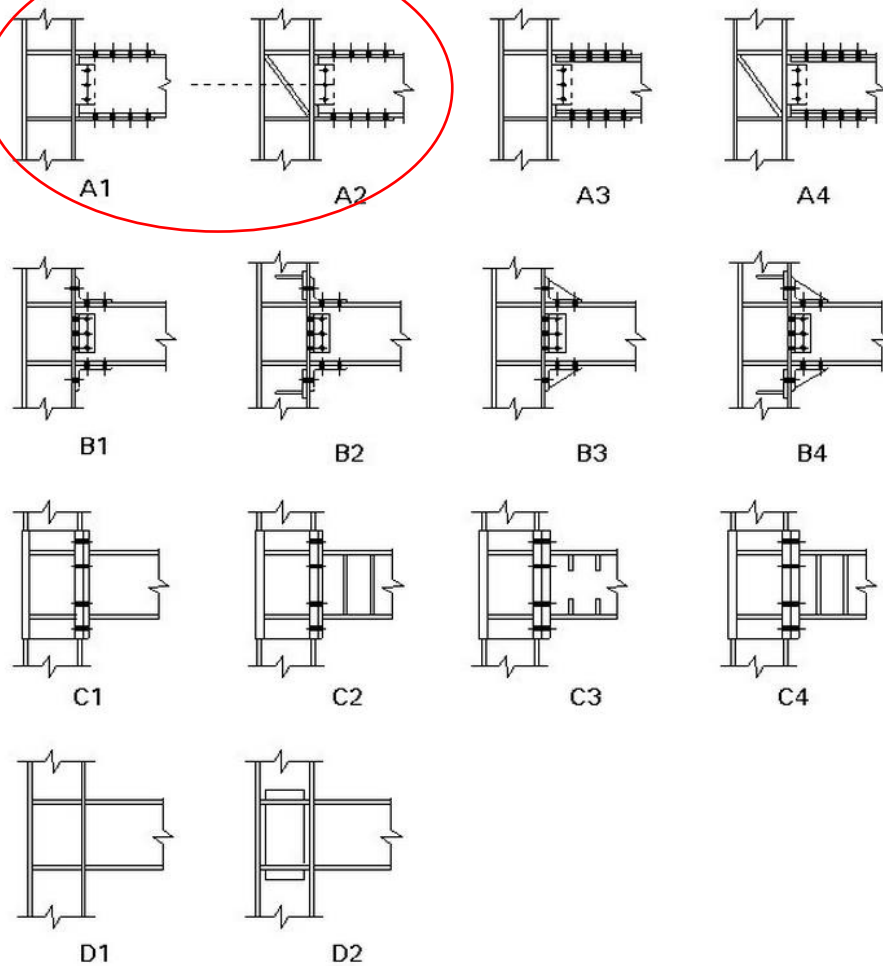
Types of beam-to-column connections tested by Ballio, Mazzolani et al.
